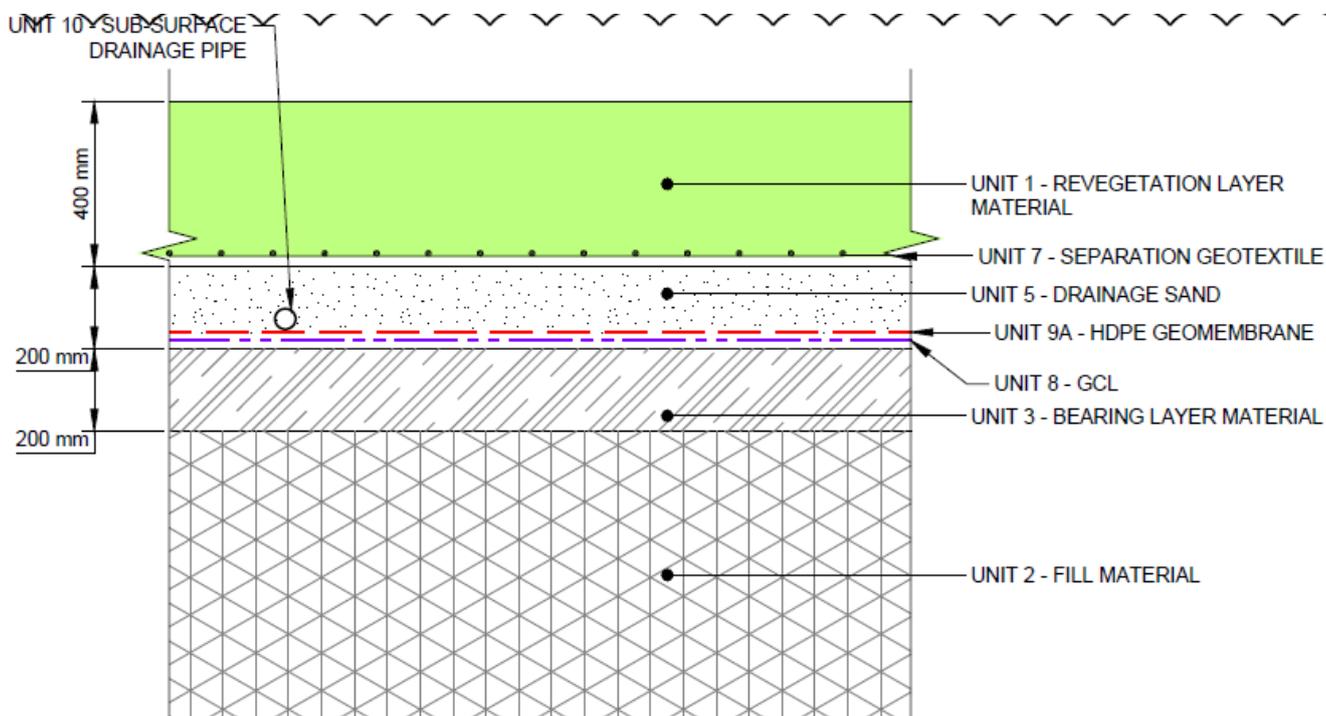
Figure B: Cap Profile (Extract from Drawing 15-43252-Rev05)
